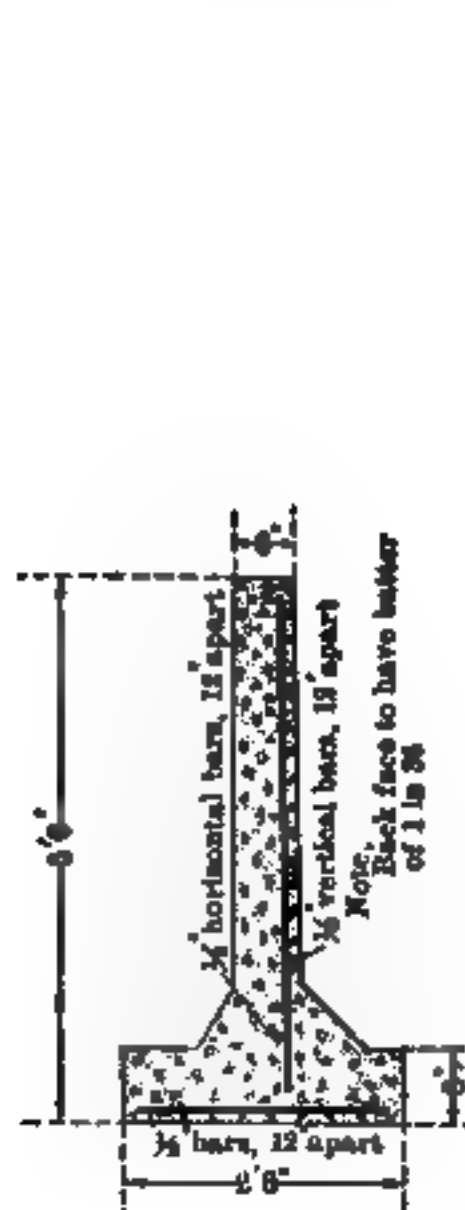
Reinforced-concrete Retaining-wall, 5 ft High
